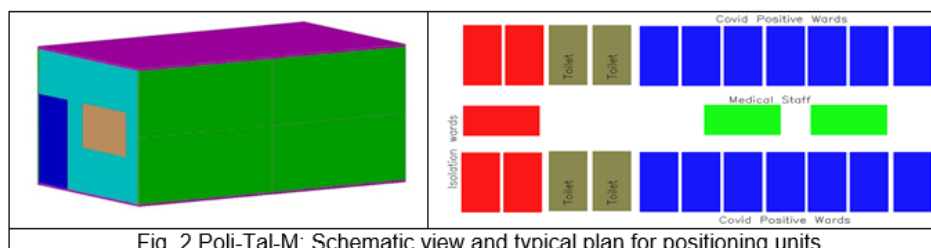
Poli-Tal-M: Schematic view and typical plan for positioning units
